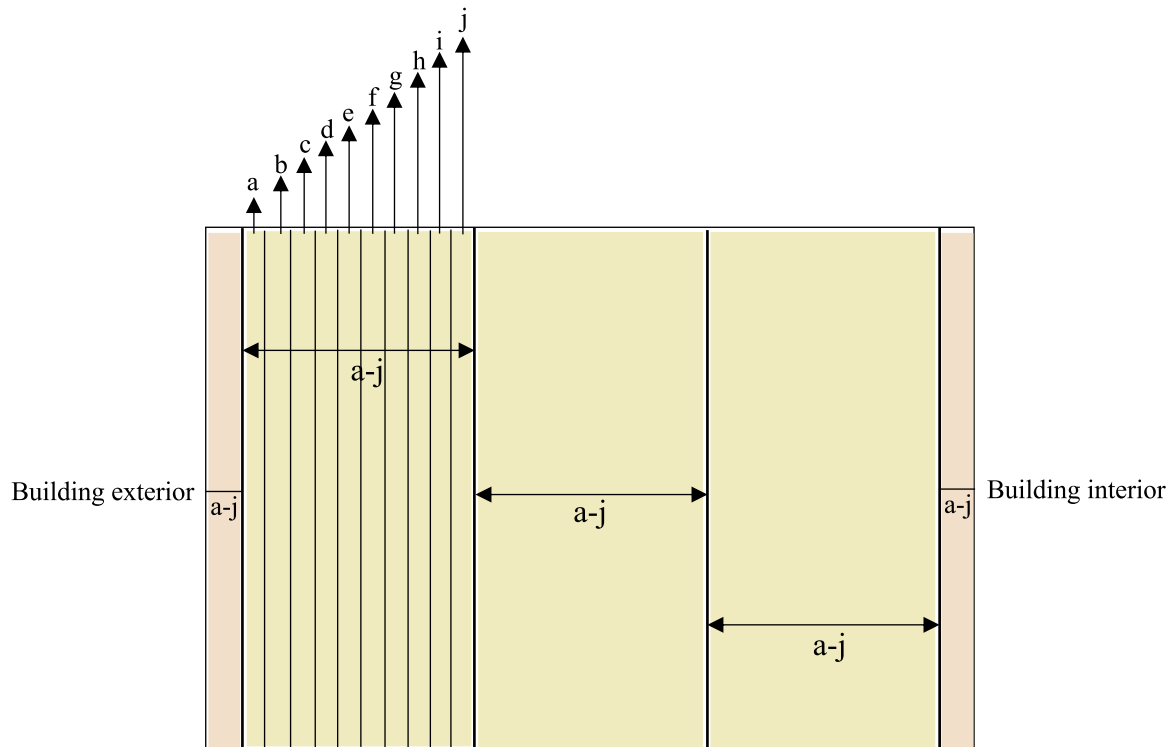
A cross-section of hemcrete wall surface made up of 5 material layers split into cells a-j.
